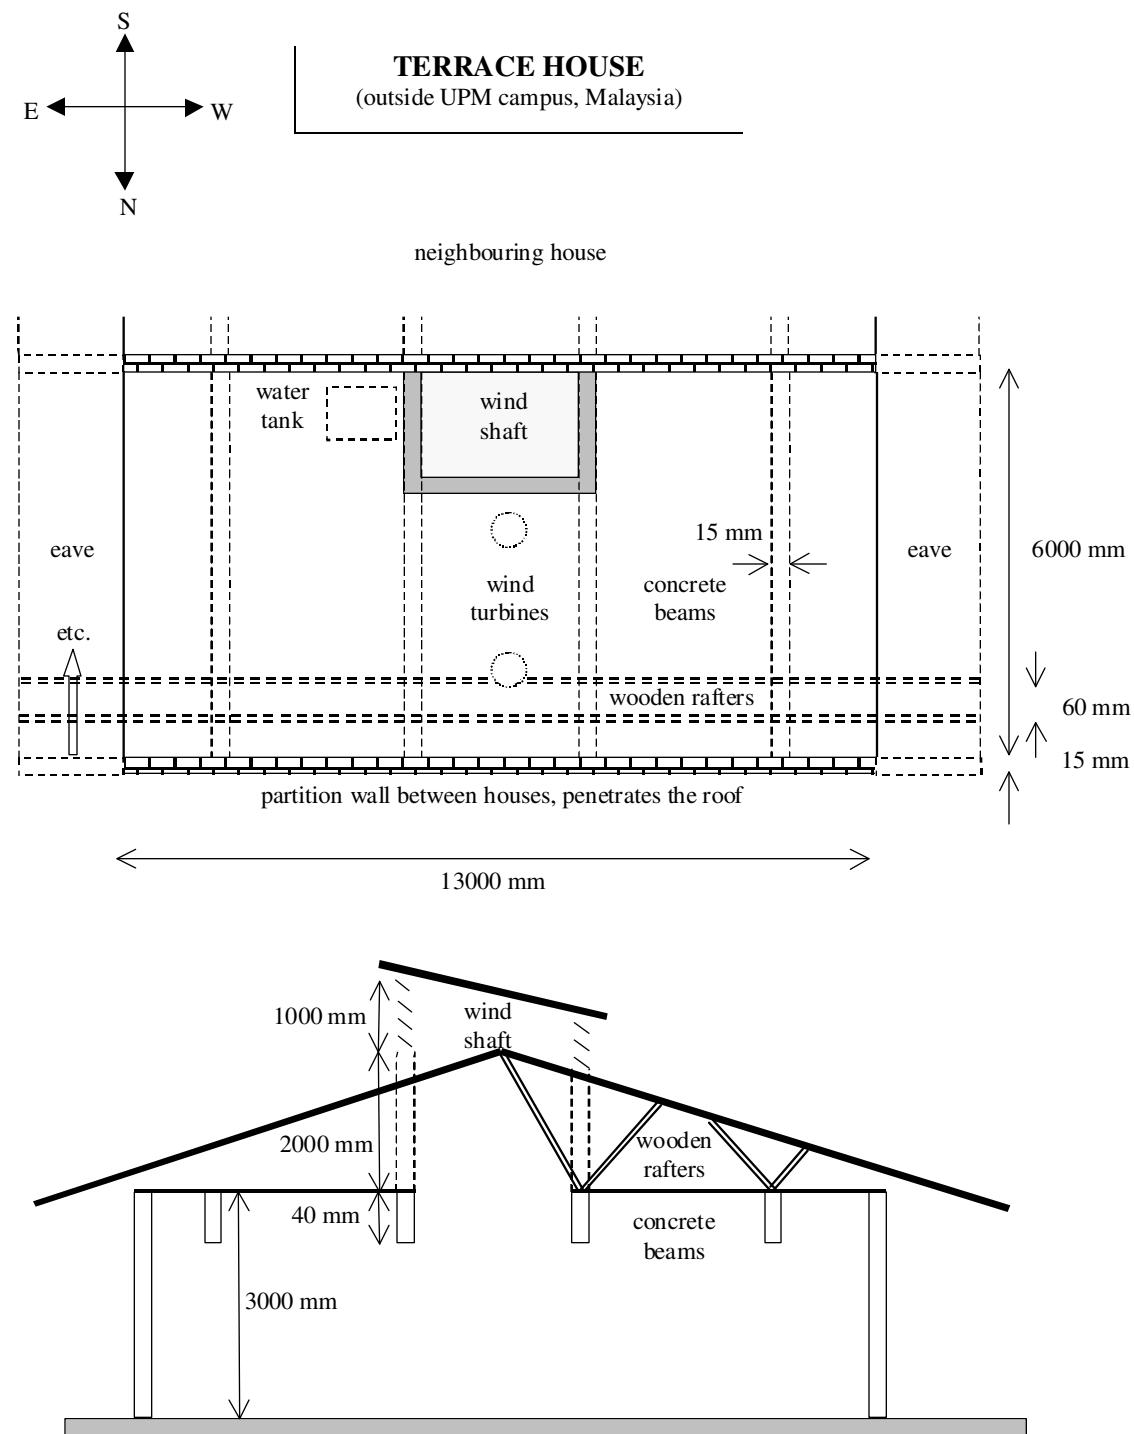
Principle sketch of terrace house; a very common residential house in Malaysia.
